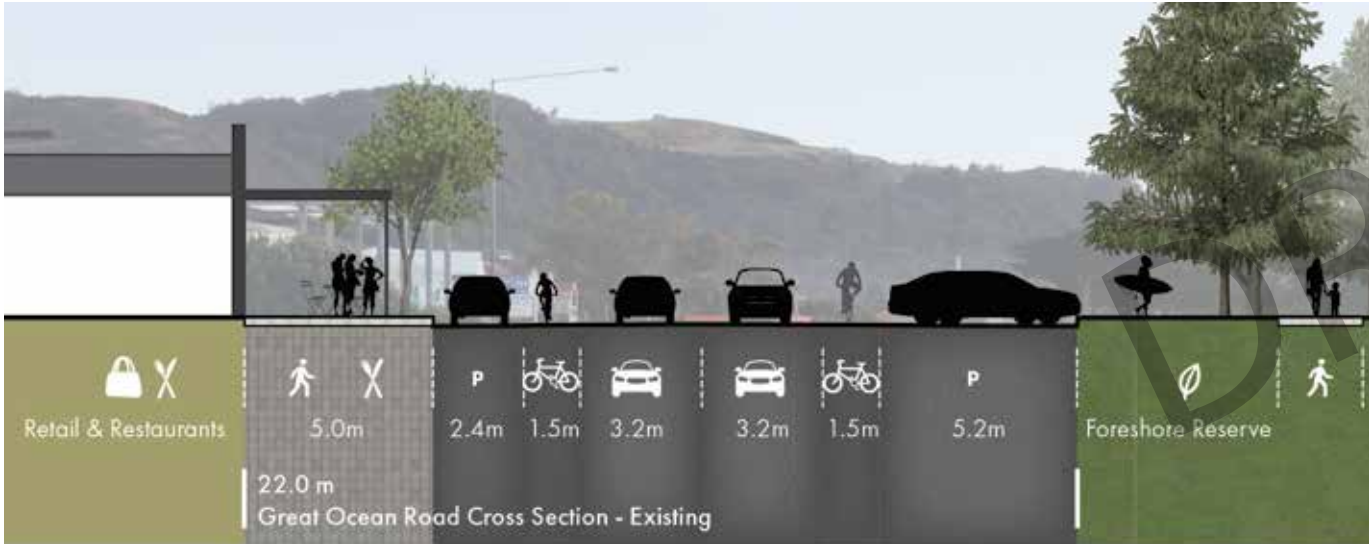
Great Ocean Road A-A'- Existing Cross Section
